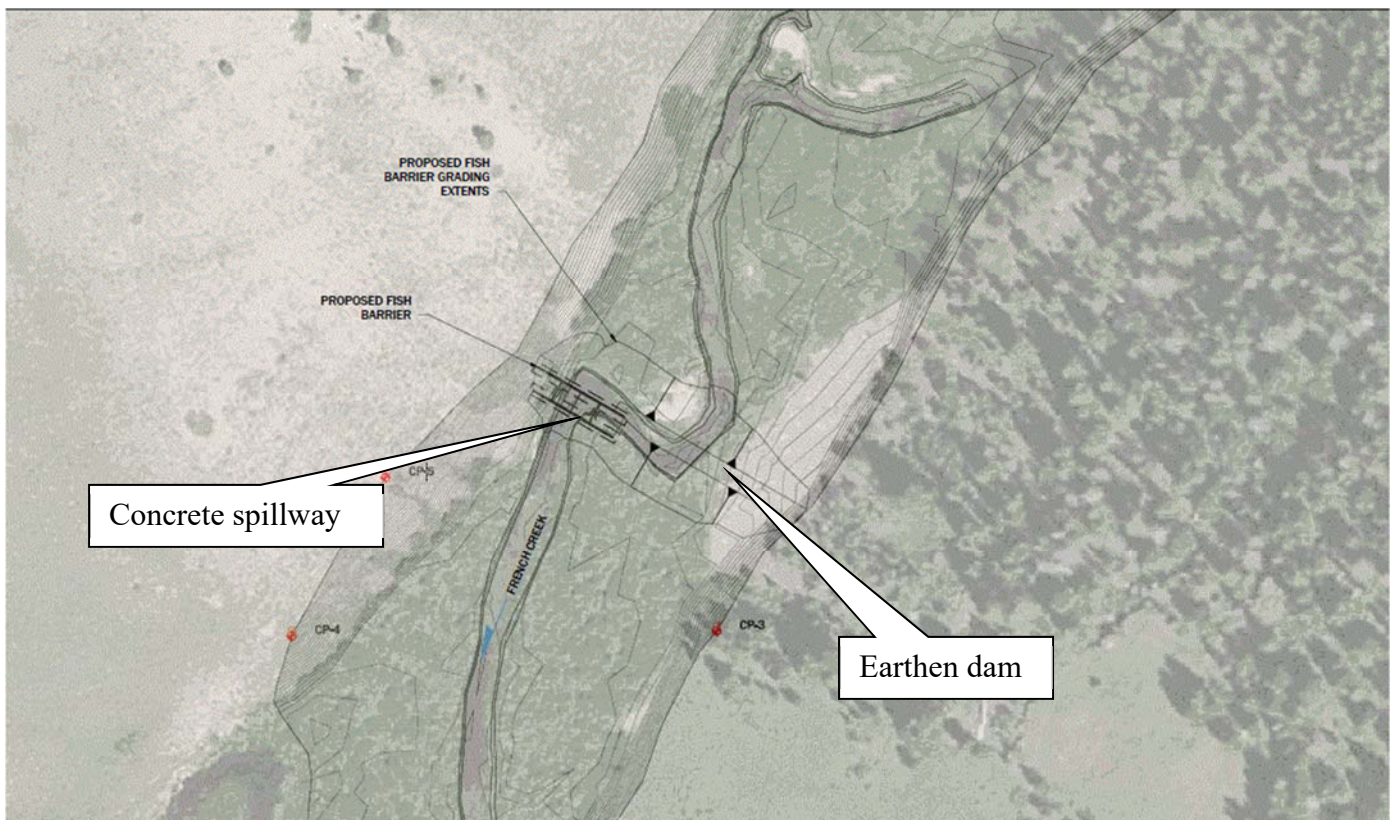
Drawings of the proposed fish barrier on French Creek showing the concrete spillway and earthen portions of the structure
